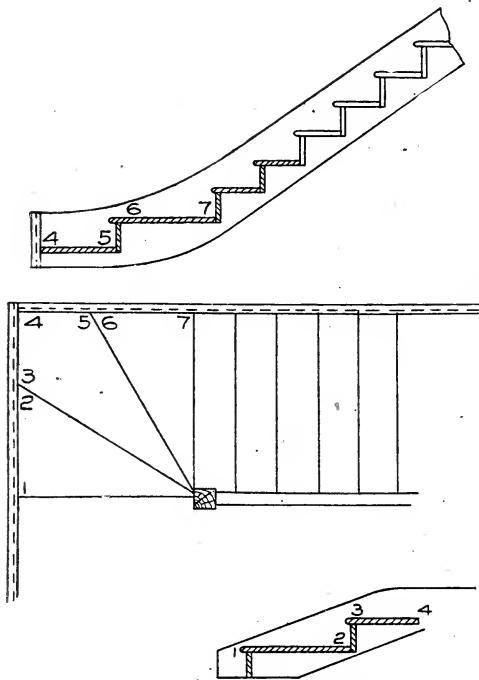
Elevation and Plan of Dog-Legged Stair with Three Winders and Six Flyers.
